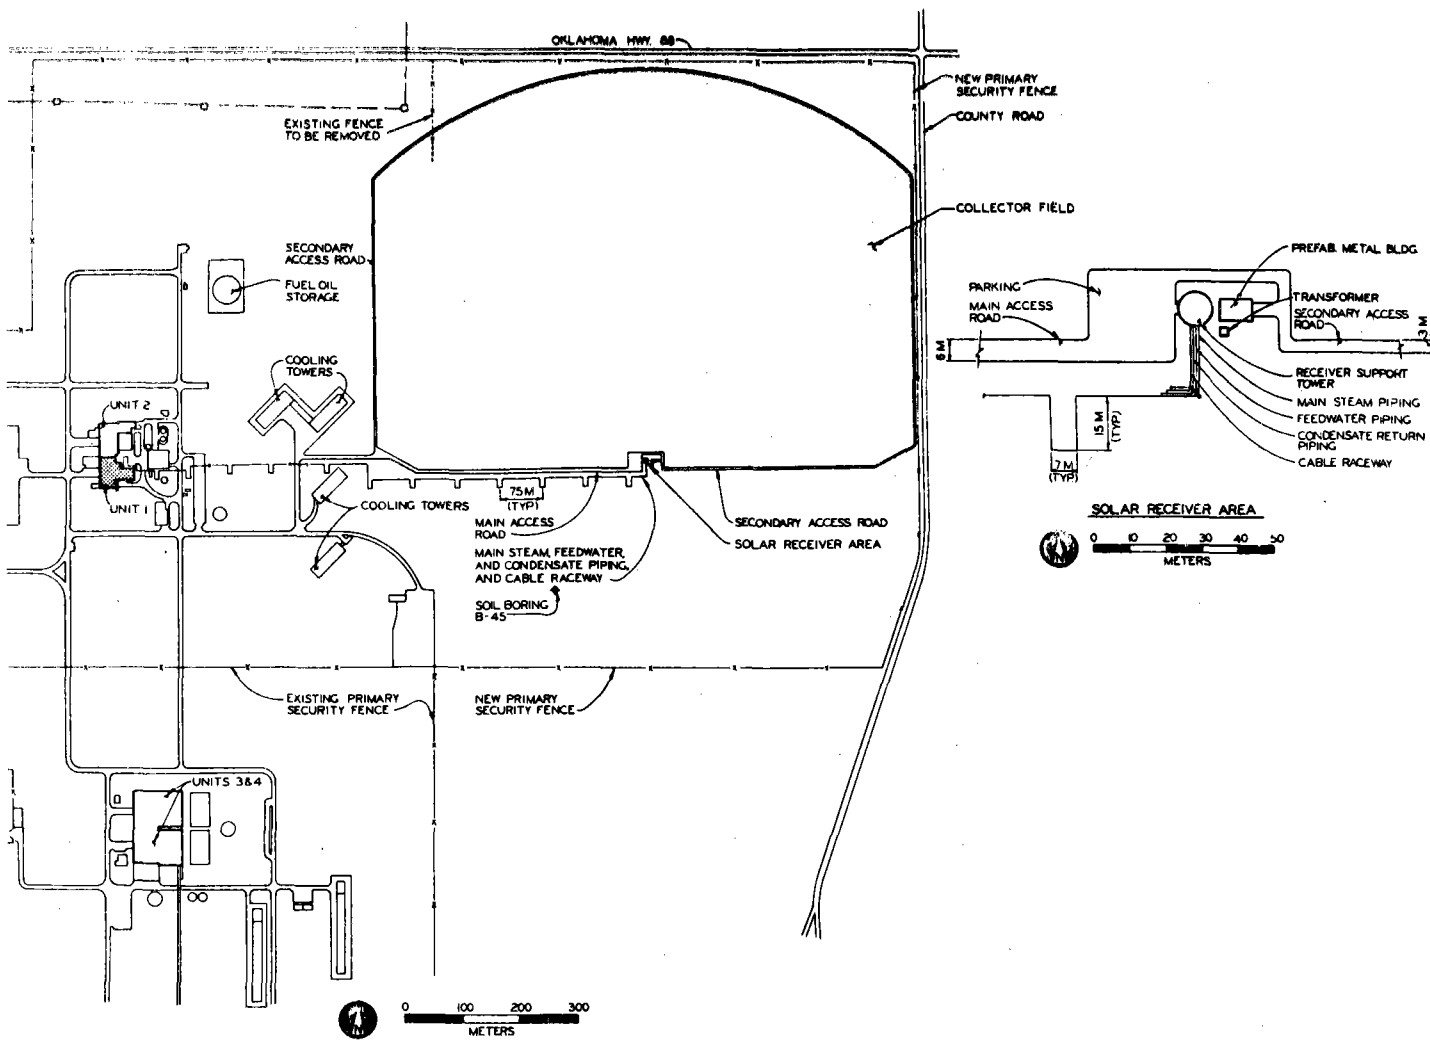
SITE ARRANGEMENT OF REPOWERED PLANT
